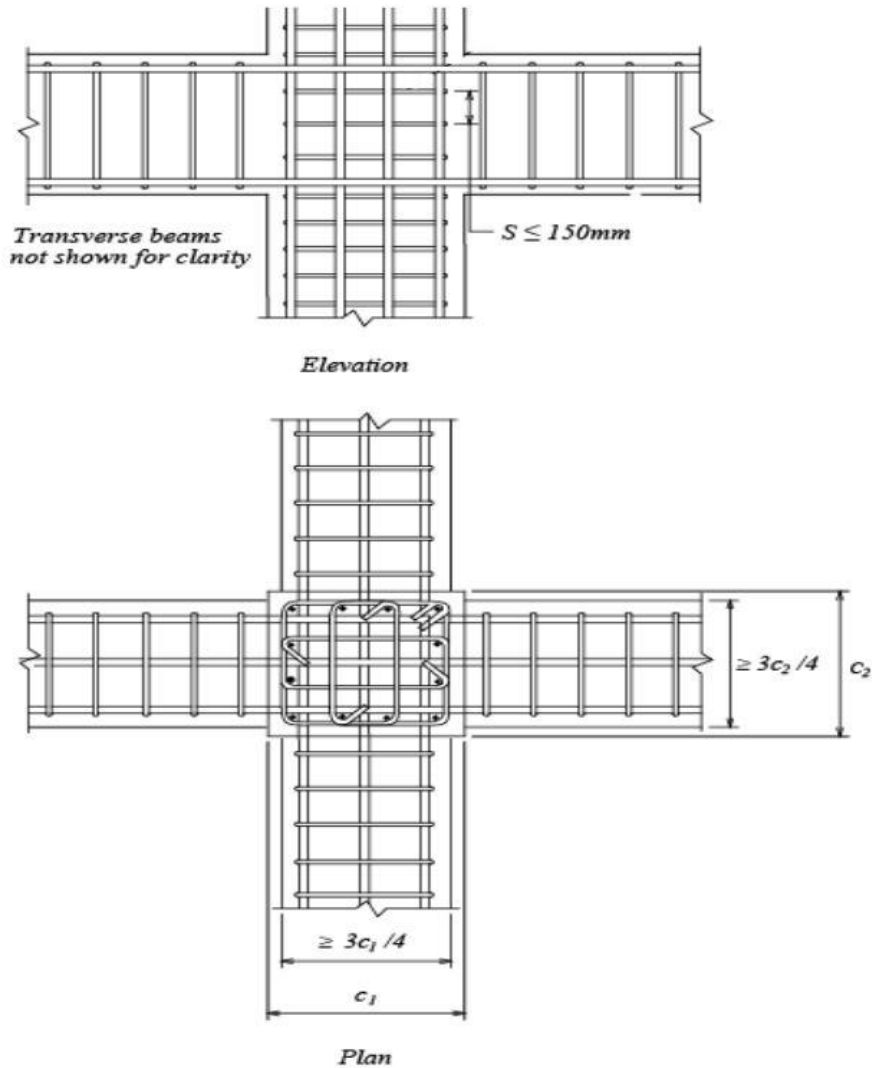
Transverse reinforcement requirements for joints confined by structural member (BNBC 2020)
